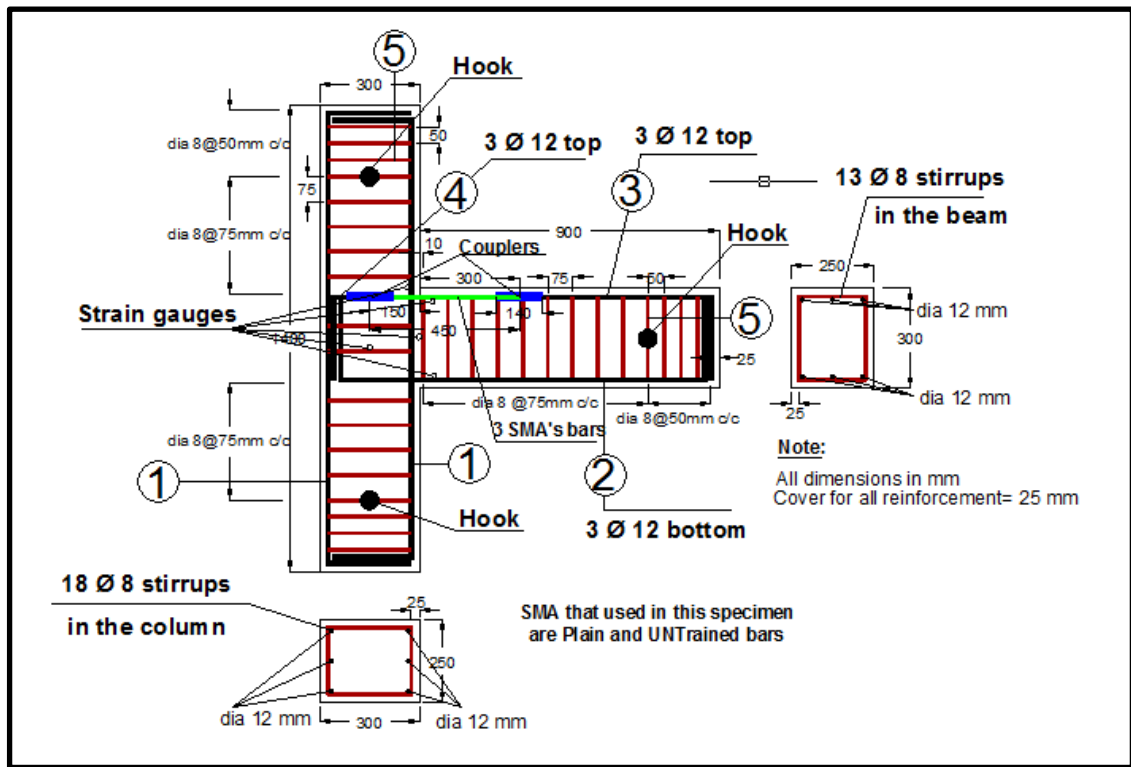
8: Geometry and reinforcement details of NiTi-BCJ-5 specimen
